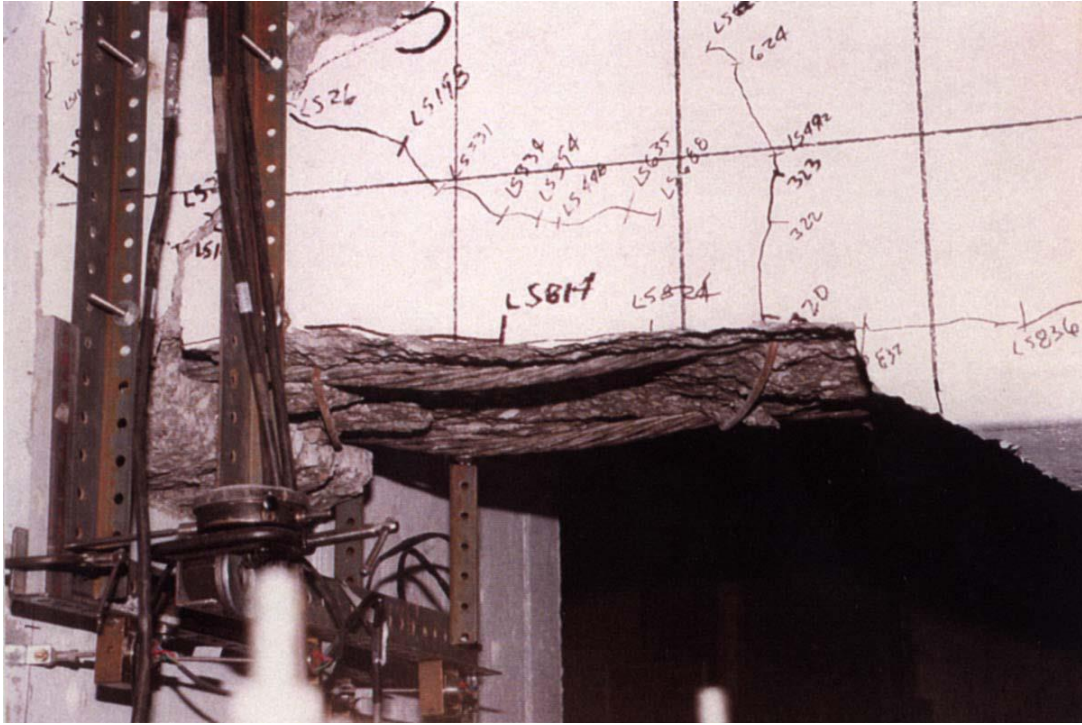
Concrete spalling damage during lab test (Tabatabai, Oesterle and Lawson 1999).
